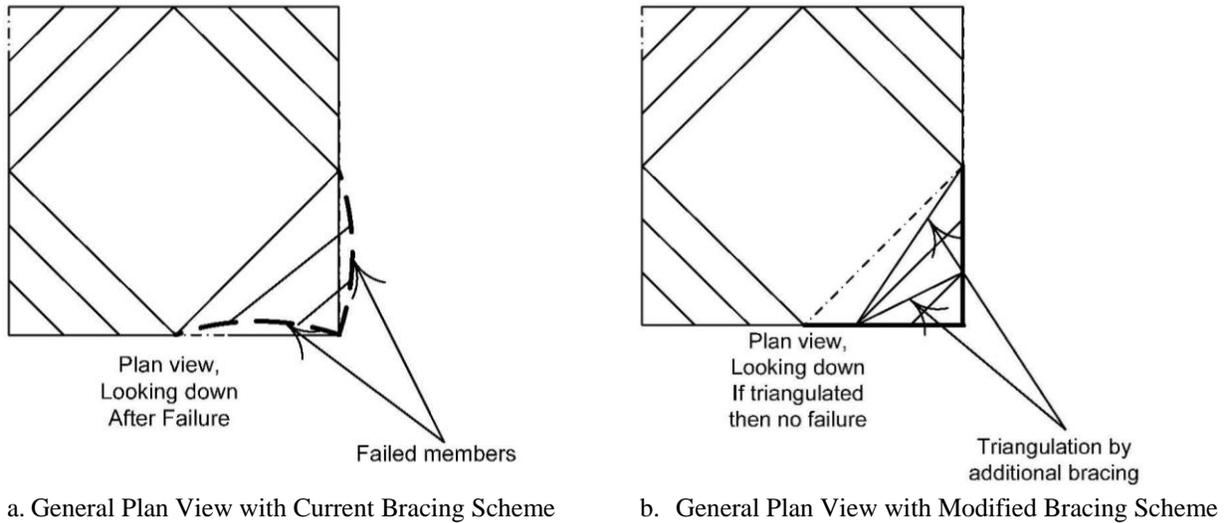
General Plan View of Vertical and Horizontal Bracing, a) Showing One Leg with Buckled Vertical Braces, and b) Proposed Bracing Members Added to Prevent Buckling Mode as Illustrated in a).
